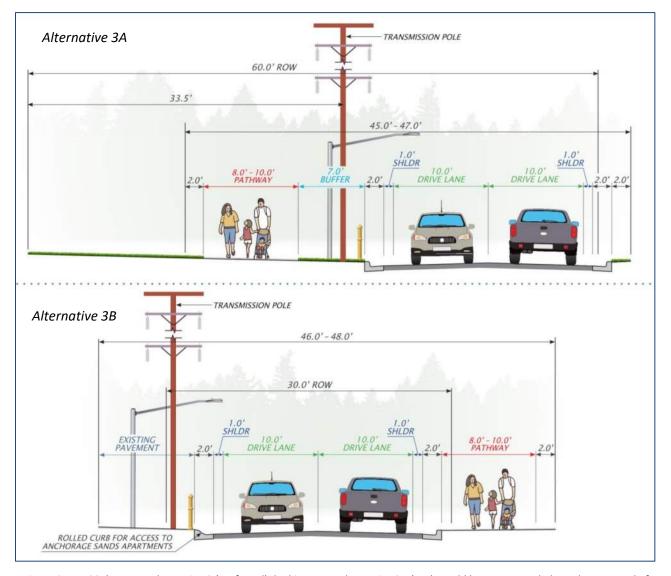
W. 32<sup>nd</sup> Avenue Alternative 3 (preferred), looking east. Alternative 3A (top) would be constructed along the west end of W. 32<sup>nd</sup> Avenue (along Aquarian Charter School). Alternative 3B (bottom) would be constructed along the east end of W. 32<sup>nd</sup> Avenue (along Anchorage Sands Apartments).
